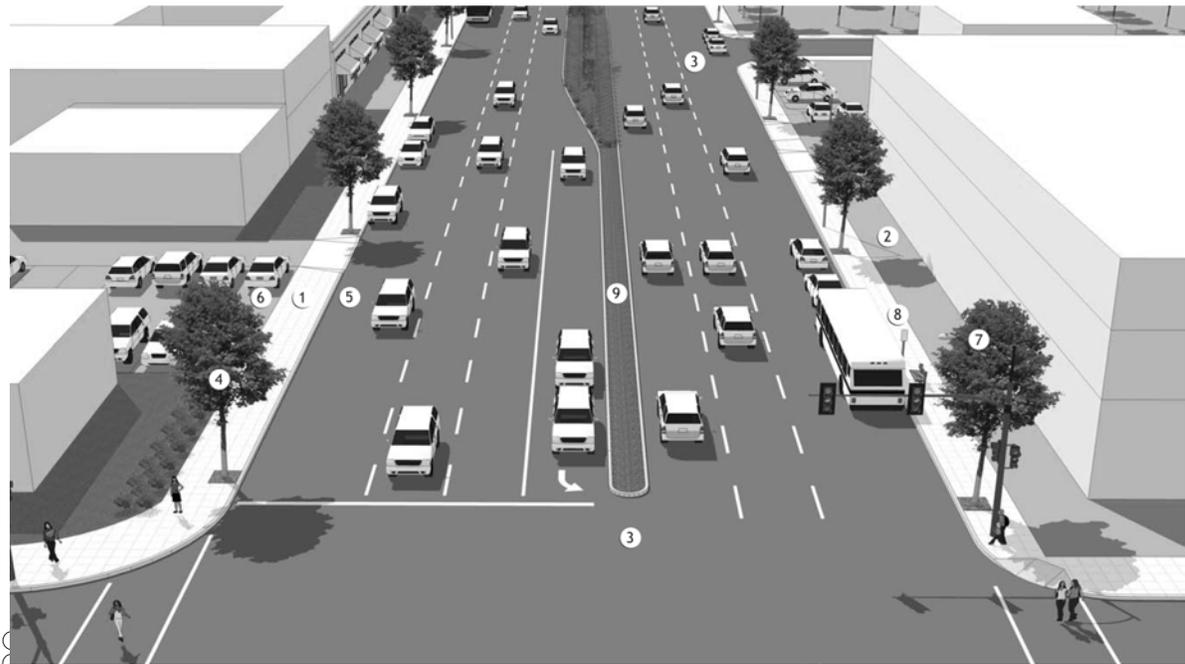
WINCHESTER BOULEVARD EXISTING - 100 FOOT CURB-TO-CURB WIDTH
